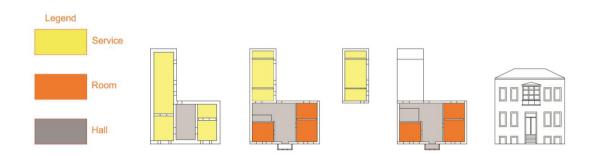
The base sample of the two-story İzmir Houses with plan type 5
